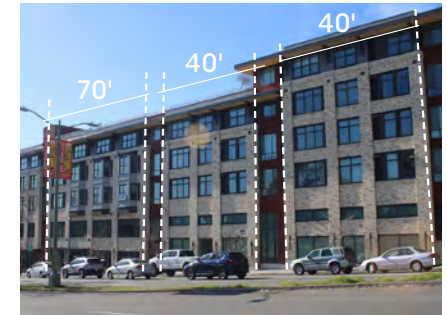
Example of typical facade articulation and modulation widths along Broadway
